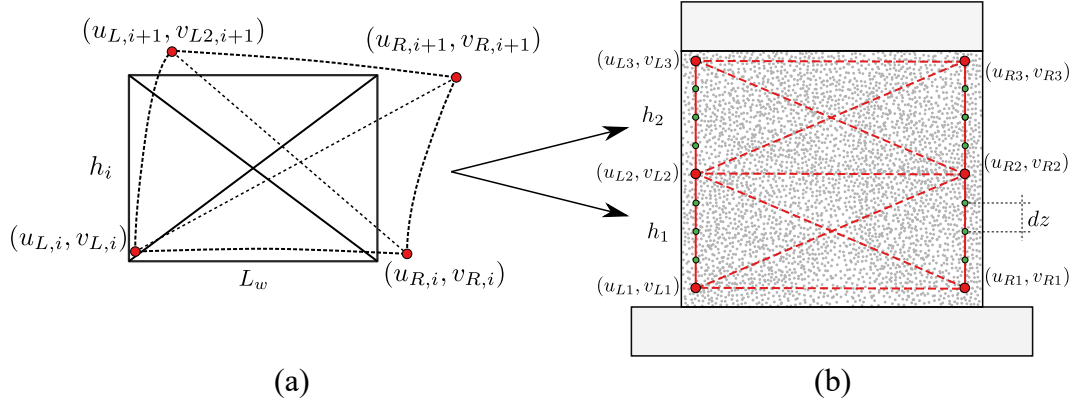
(a) Deformation of a shear wall subjected to lateral load (b) Arrangement of virtual transducers which divides the wall panel into two elements of (a).
